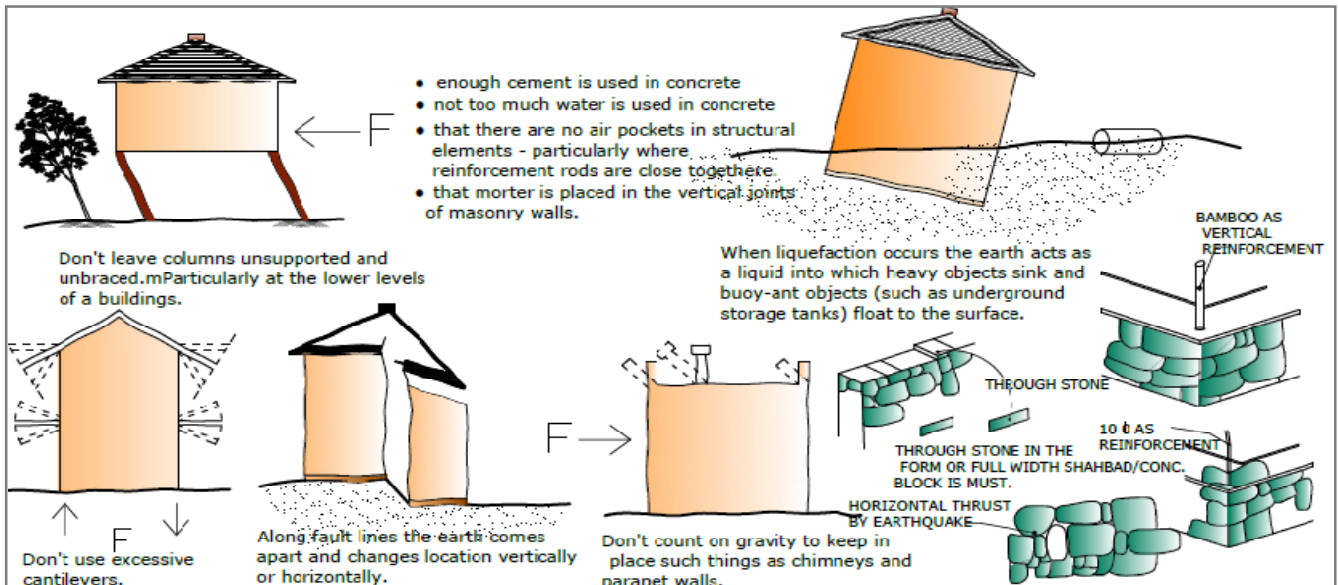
Diagram indicating faulty constructions and few simple detailing of rubble walls.
